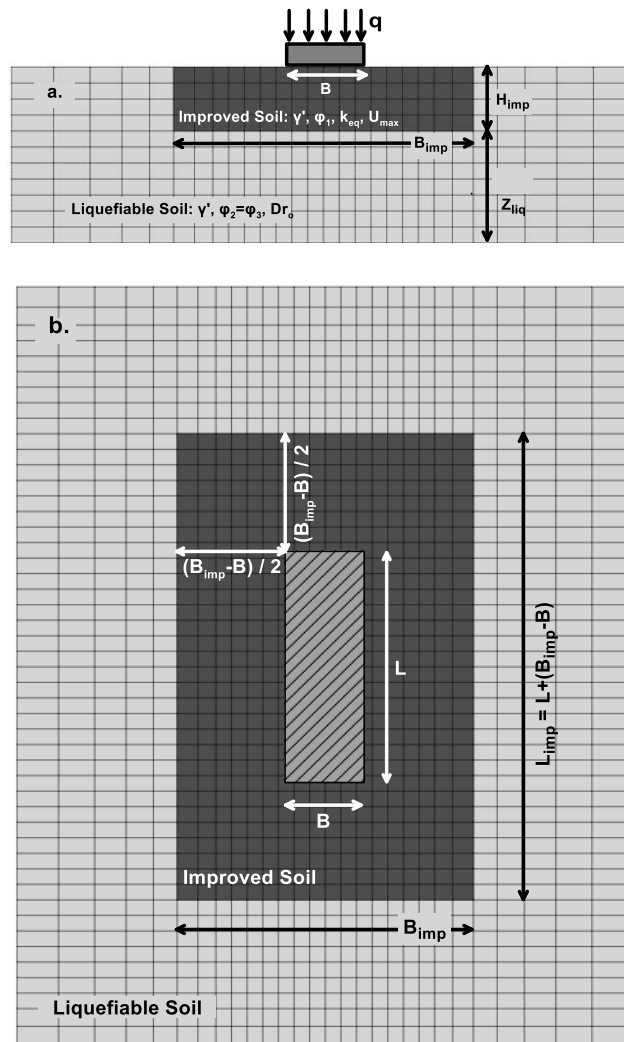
(a) Cross section and (b) Plan view of the footing and the improved soil area.
